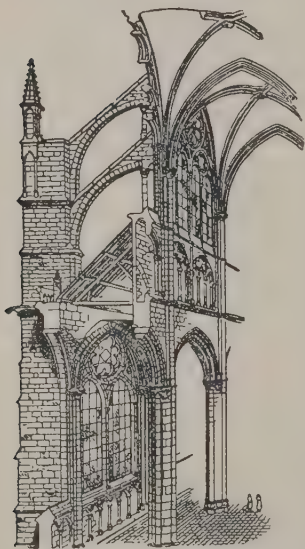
Section of a Gothic Cathedral, showing construction: pillars, windows, pointed arches, flying buttresses, supporting buttresses.
